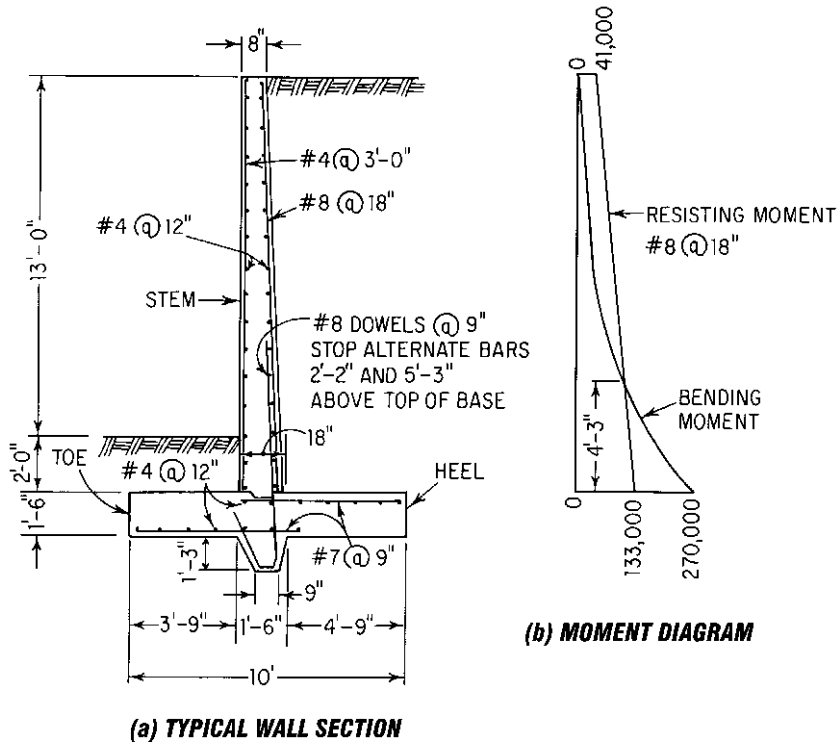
Cantilever retaining wall. (a) Vertical section shows main reinforcing steel placed vertically in the stem. (b) Moment diagram.
